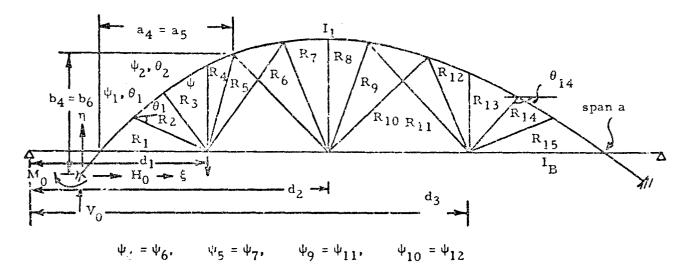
LEANING ARCHES BRIDGE, ELEVATION VIEW
